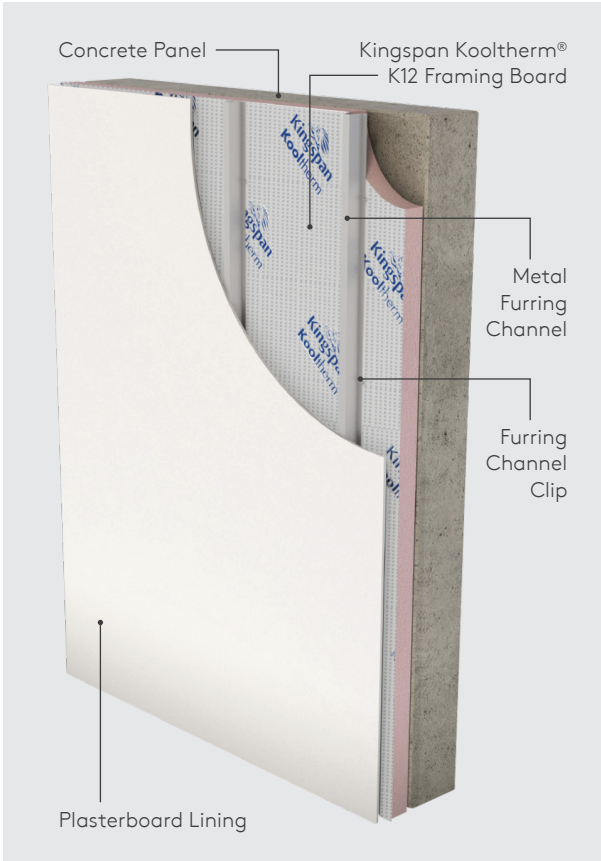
Commercial Concrete Wall Installation with a Clip and Channel System.
